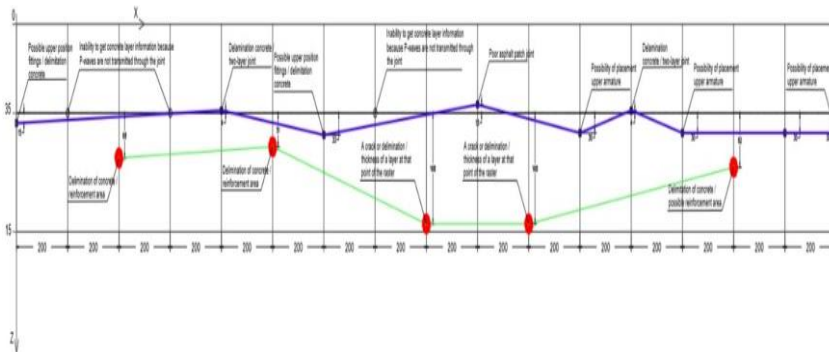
Longitudinal cross-section of the bridge with the concrete delamination and possible damage to the reinforcement (red dots) and a realistic concrete-asphalt joint line (blue line)
